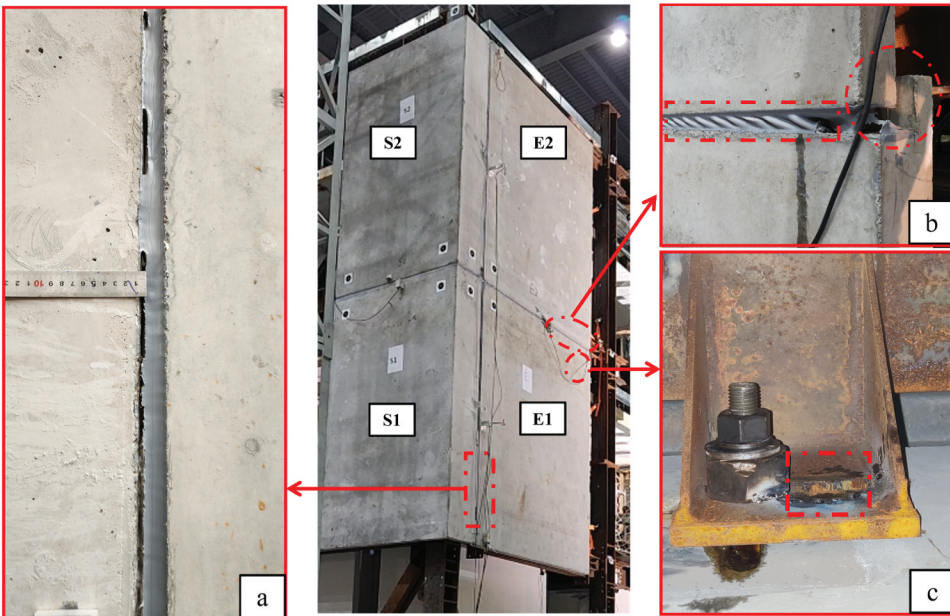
Damage observed in the east elevation cladding panels: (a) sealant detachment at the vertical joint between panels E1 and S1 at 0.51% PIDR (0.20 g shaking in the longitudinal (NS/X) direction); (b) horizontal shifting of cladding panel E1 and appearance of sealant wrinkles after 1.41% PIDR (0.60 g shaking in the longitudinal (NS/X) direction); (c) failure of tack-weld.
